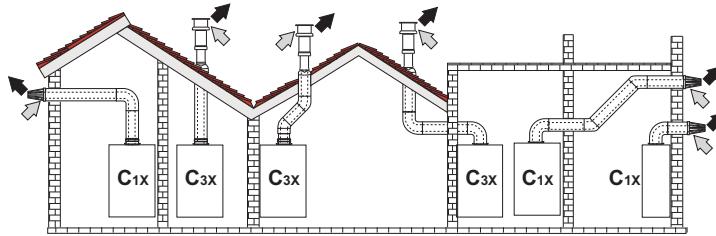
Examples of connection with coaxial pipes (➡ = Air / ➔ = Fumes)
